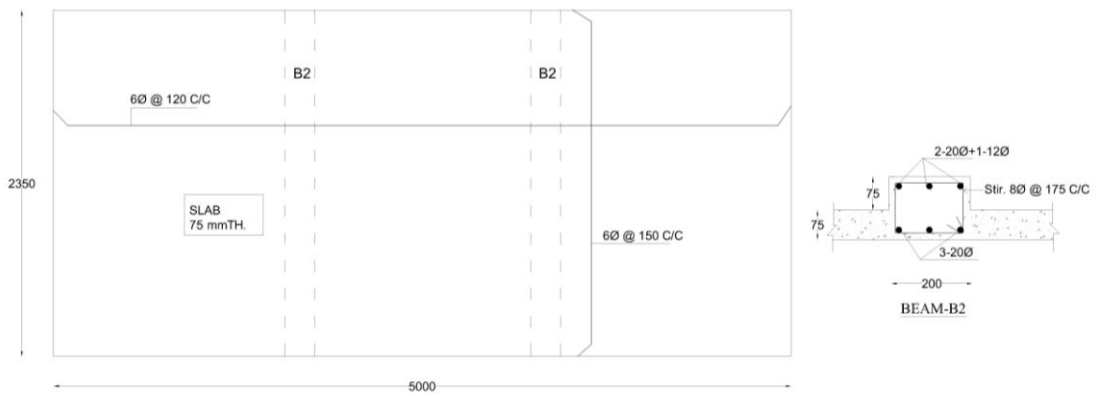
Reinforcement Detailing of Slab, 3PSR
